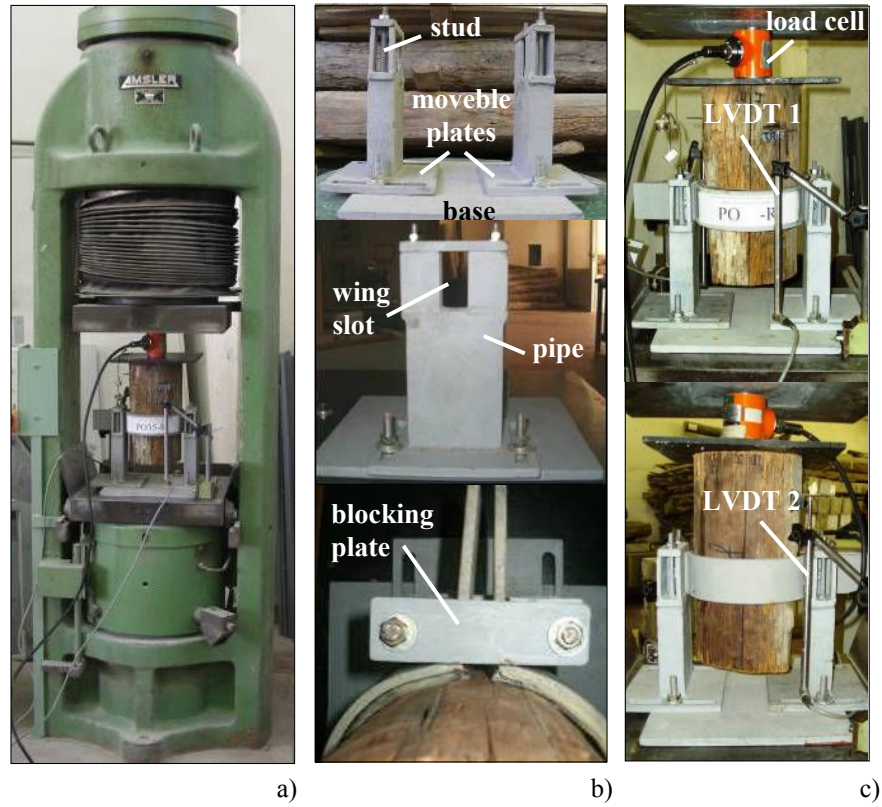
Monotonic push-out tests – Testing apparatus and set-up: a) Load machine Amsler; b) Support steel frame; c) Specimen equipped for test.
